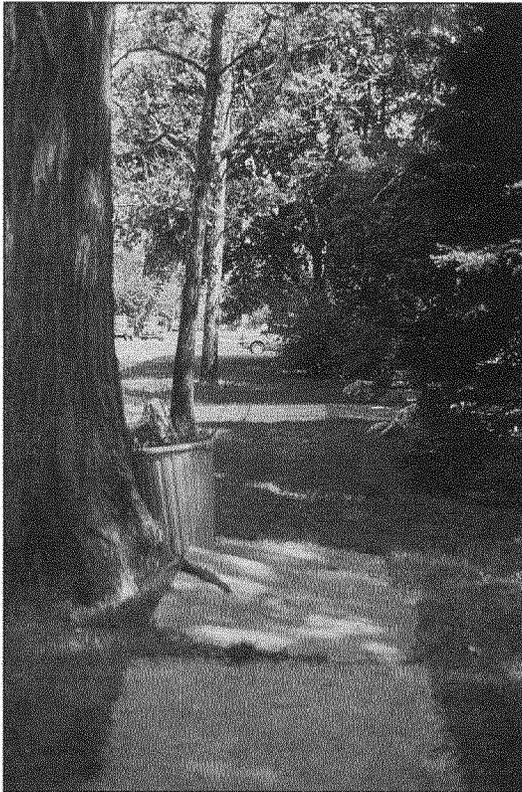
Sidewalks that end abruptly should be avoided.
